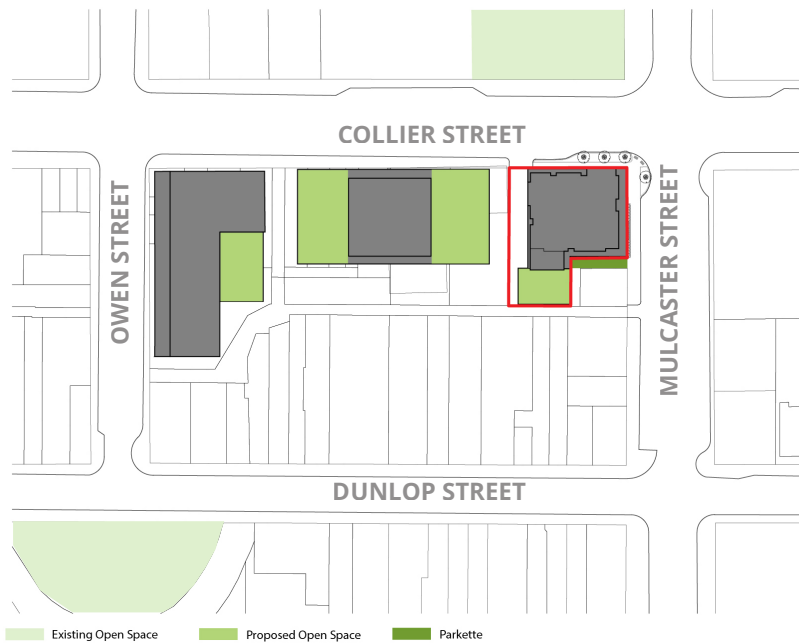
Block Plan/Context Plan - Open Spaces - prepared by MHBC.
